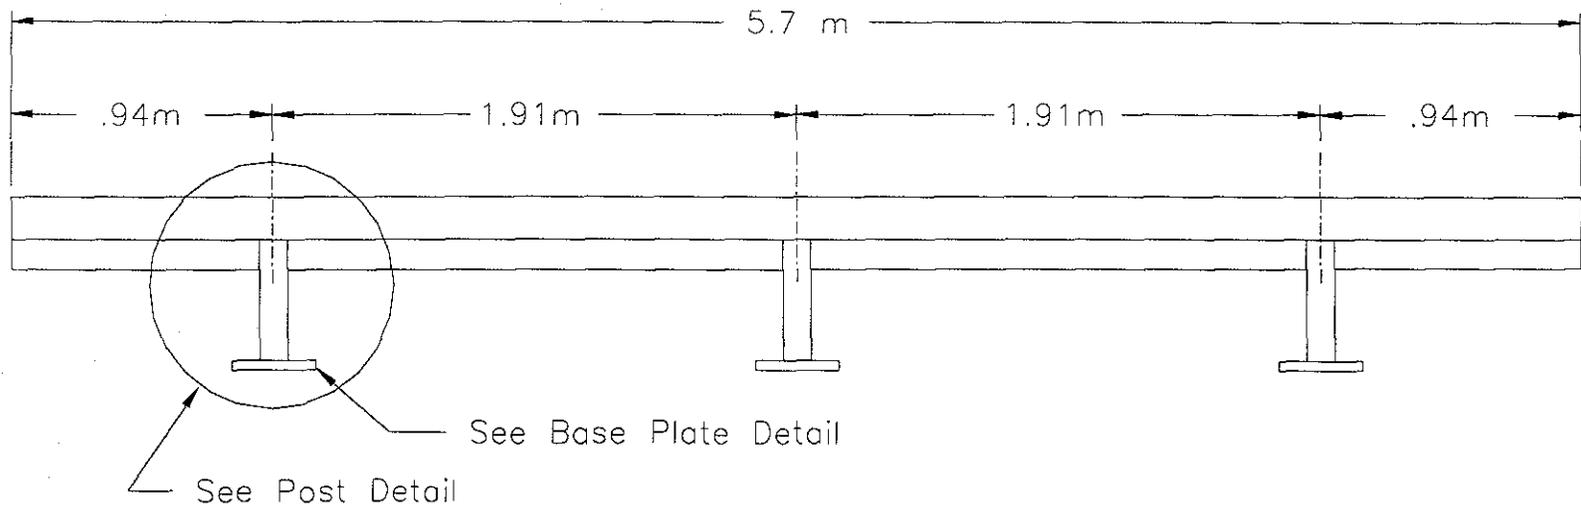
Steel reinforcement details for Washington, DC, historic bridge rail (continued).
